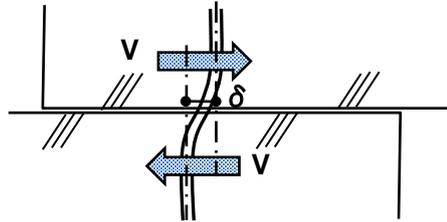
State of deformation of anchor bar on the concrete-concrete interface
